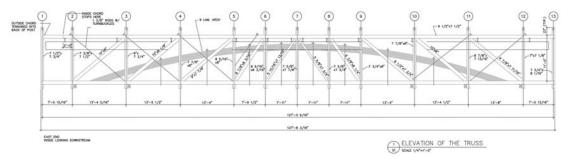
CAD Drawings - Frame elevation (by DCF)
